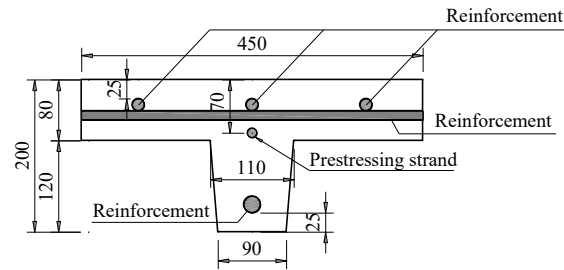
Cross-section of the proposed transverse rib in novel design of a ribbed bridge deck using HPC and prestressing steel
